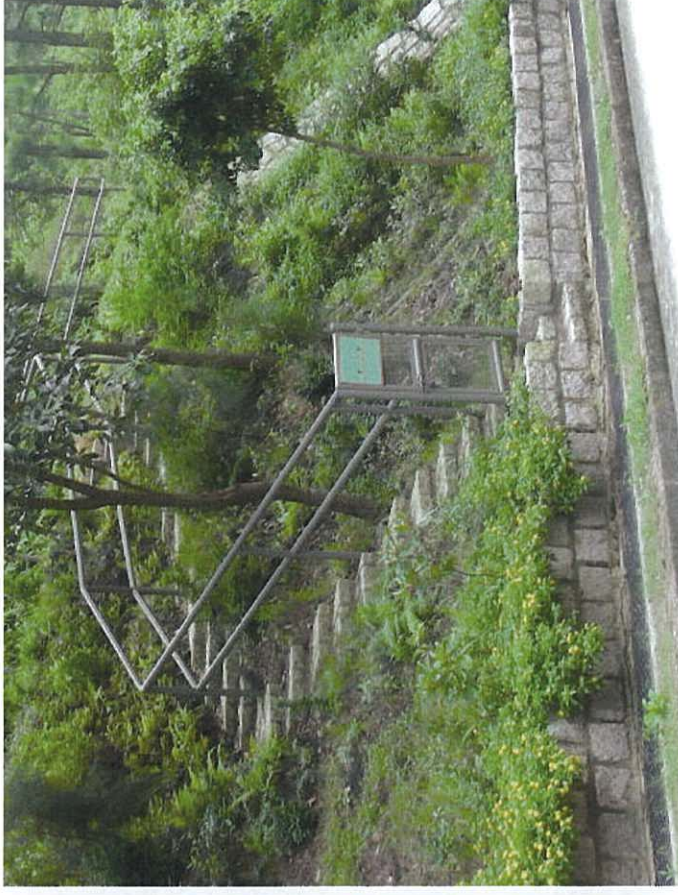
Masonry finish to the maintenance access with painted handrails and gates to blend the design with surroundings
